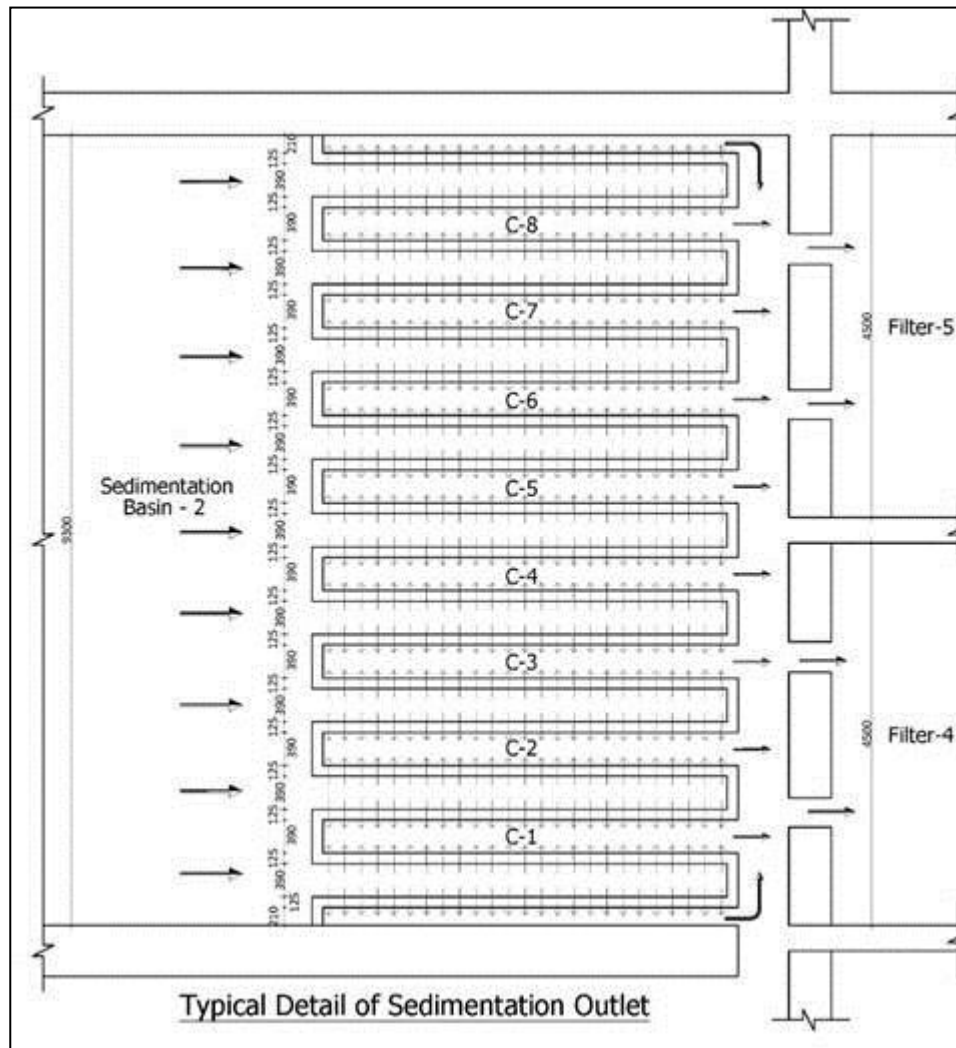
Typical Plan View of the Outlet Zone of Sedimentation Basin
